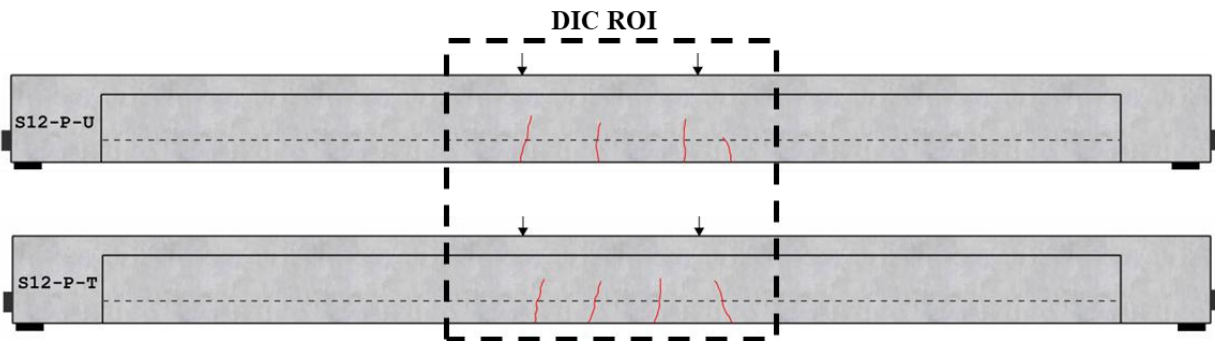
Crack map showing the observed cracks on the east face of the S12 beam specimens at the cracking load (concrete tensile stress at  $12\sqrt{f'_c}$ ).
